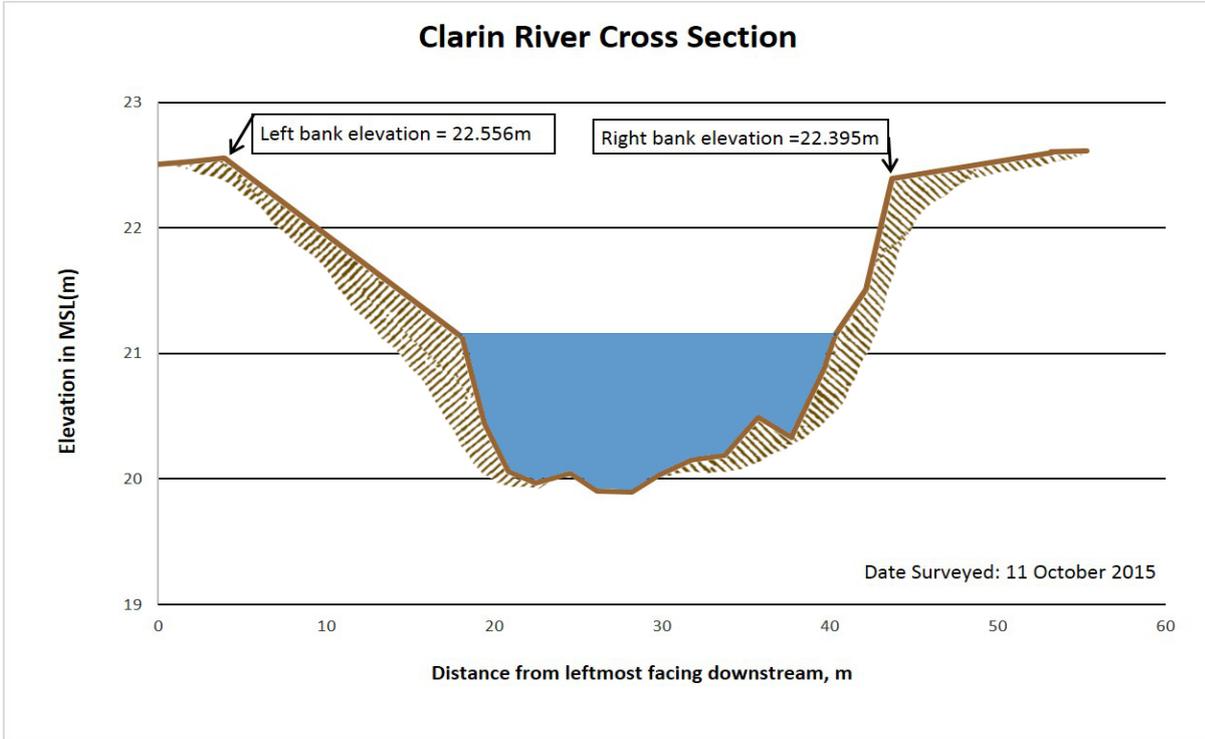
Cross-Section Plot of Masabud Pan-ay Hanging Bridge
